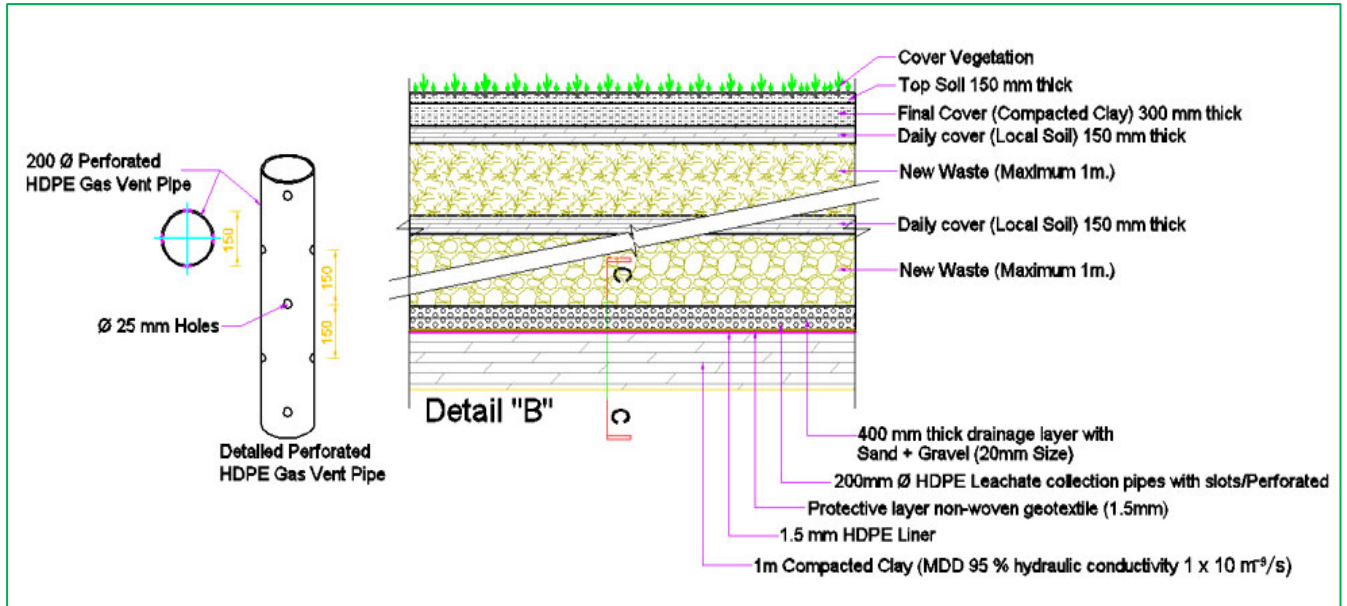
Typical cross-section of landfill cell showing leachate water drainage and landfill gas vent pipe system
